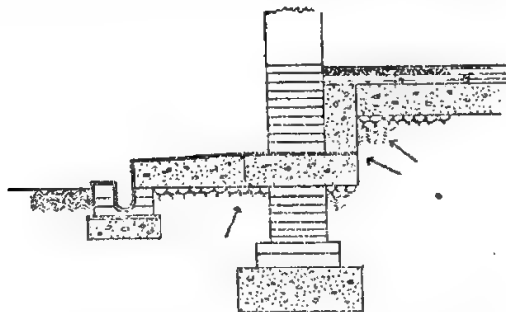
Detail of termite-proof construction: the protective layer at two levels.
